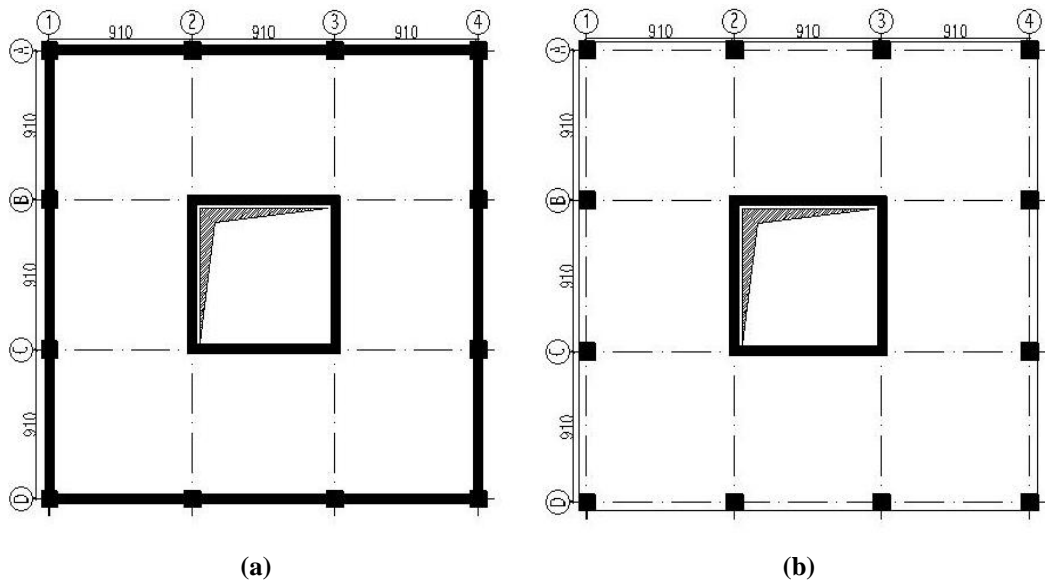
Considered reinforced concrete structure a) plan view of the rigid basement floors, b) plan view of the typical floors
